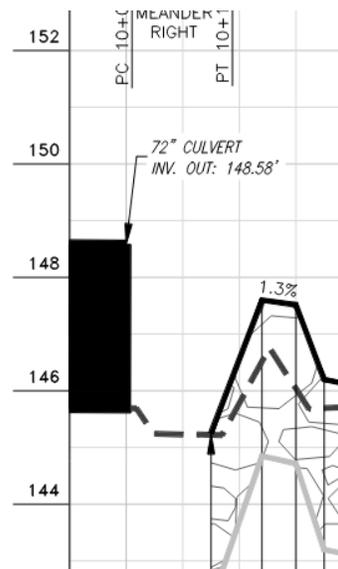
Design profile showing existing drop of over 3-ft at culvert outlet.
